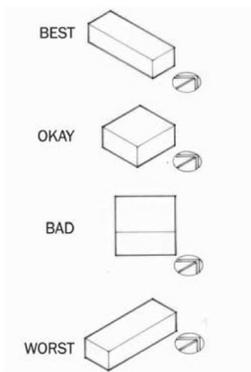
RECOMMENDED BUILDING ORIENTATIONS (ASHRAE 2004)
